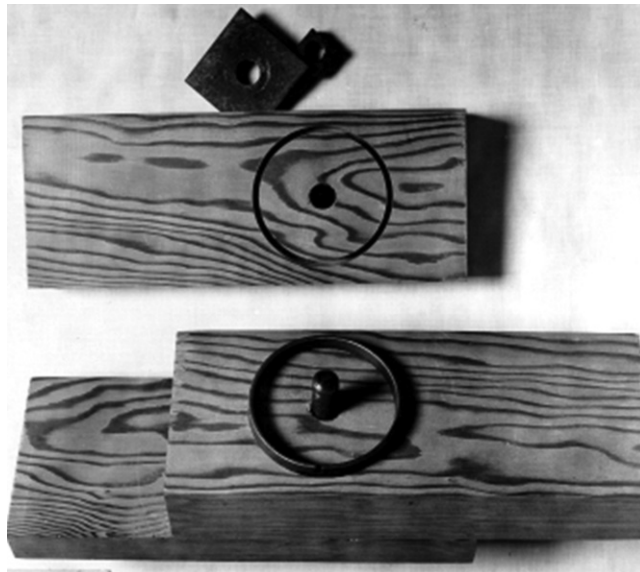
Joint with split ring connector showing connector, precut groove, bolt, washer, and nut.
